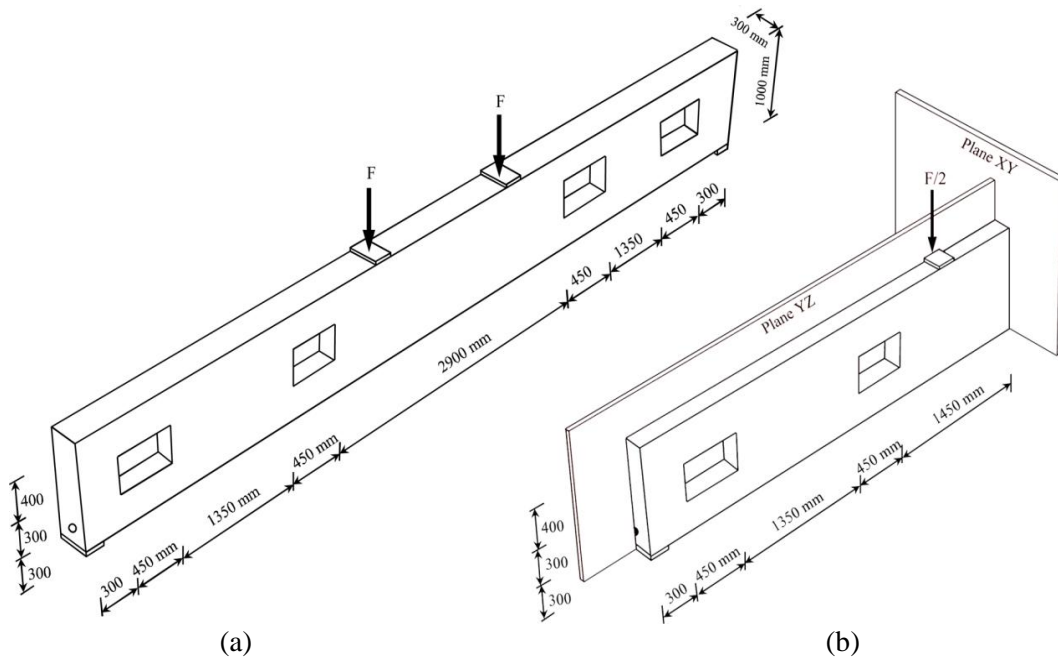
Simply supported prestressed concrete beam with openings: (a) Full model; (b) Symmetric model
